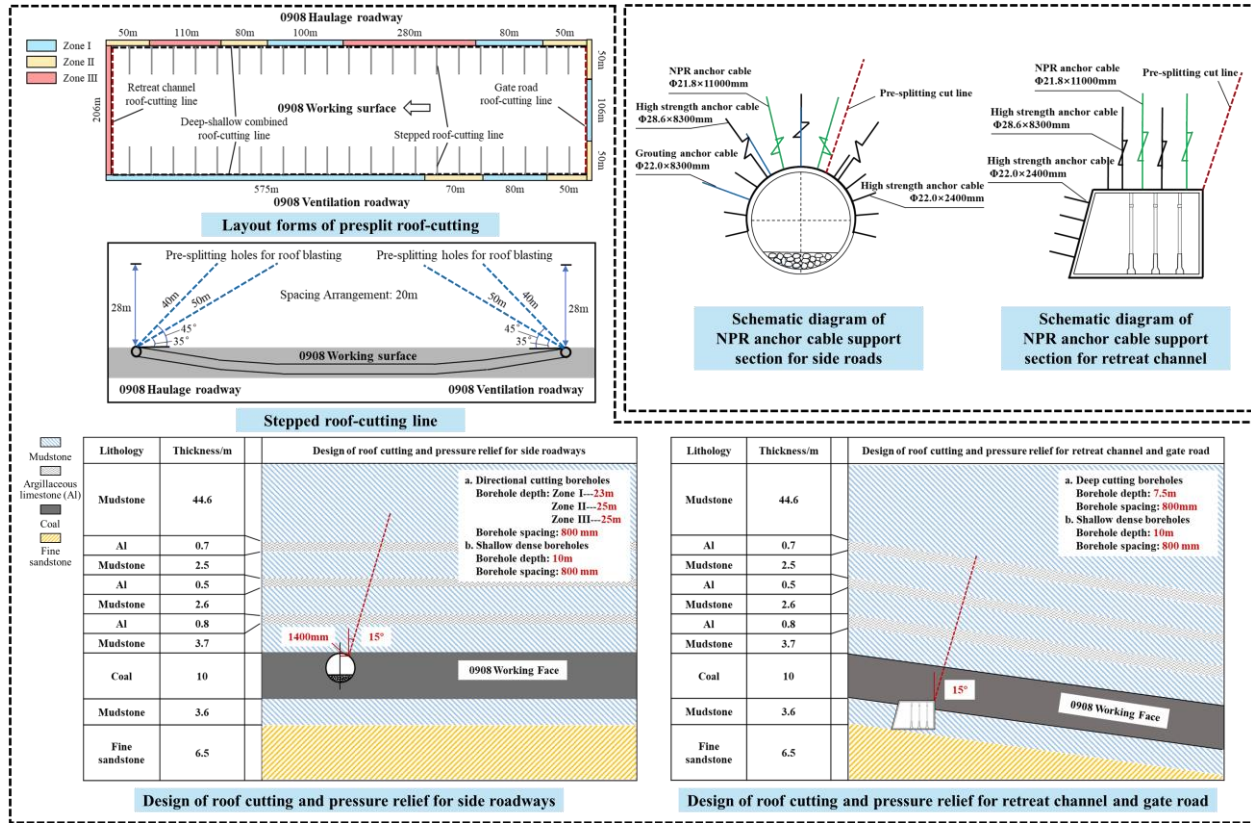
Layout forms and key parameters of pre-splitting roof cutting and anchor cable support
